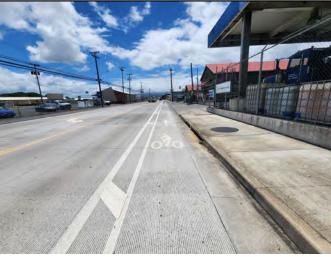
Kalaniana'ole Street New Sidewalk (Makai Side)
